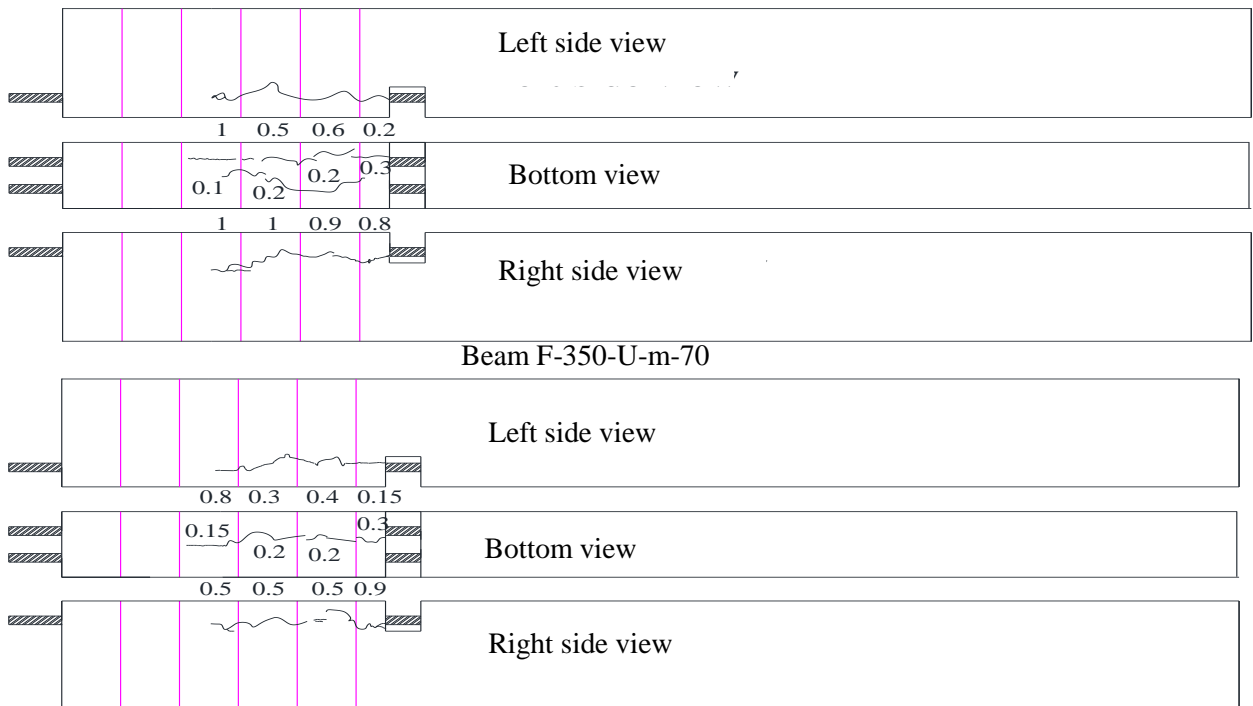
Schematic drawing of the corrosion cracks for the beams from set 2 (350 mm anchorage length) corroded to a medium corrosion level and tested for fatigue (Set 2 – Group U-m). The crack width measurements are given in mm.
